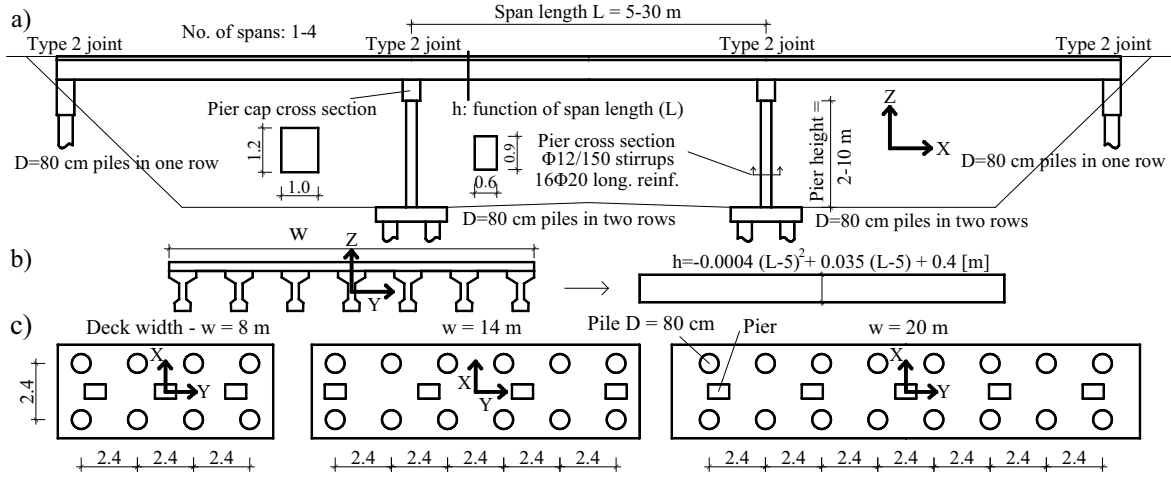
General layout of PMG bridges: a) side-view of the bridge; b) typical cross section; c) applied pile foundation arrangements for different bridge widths.
